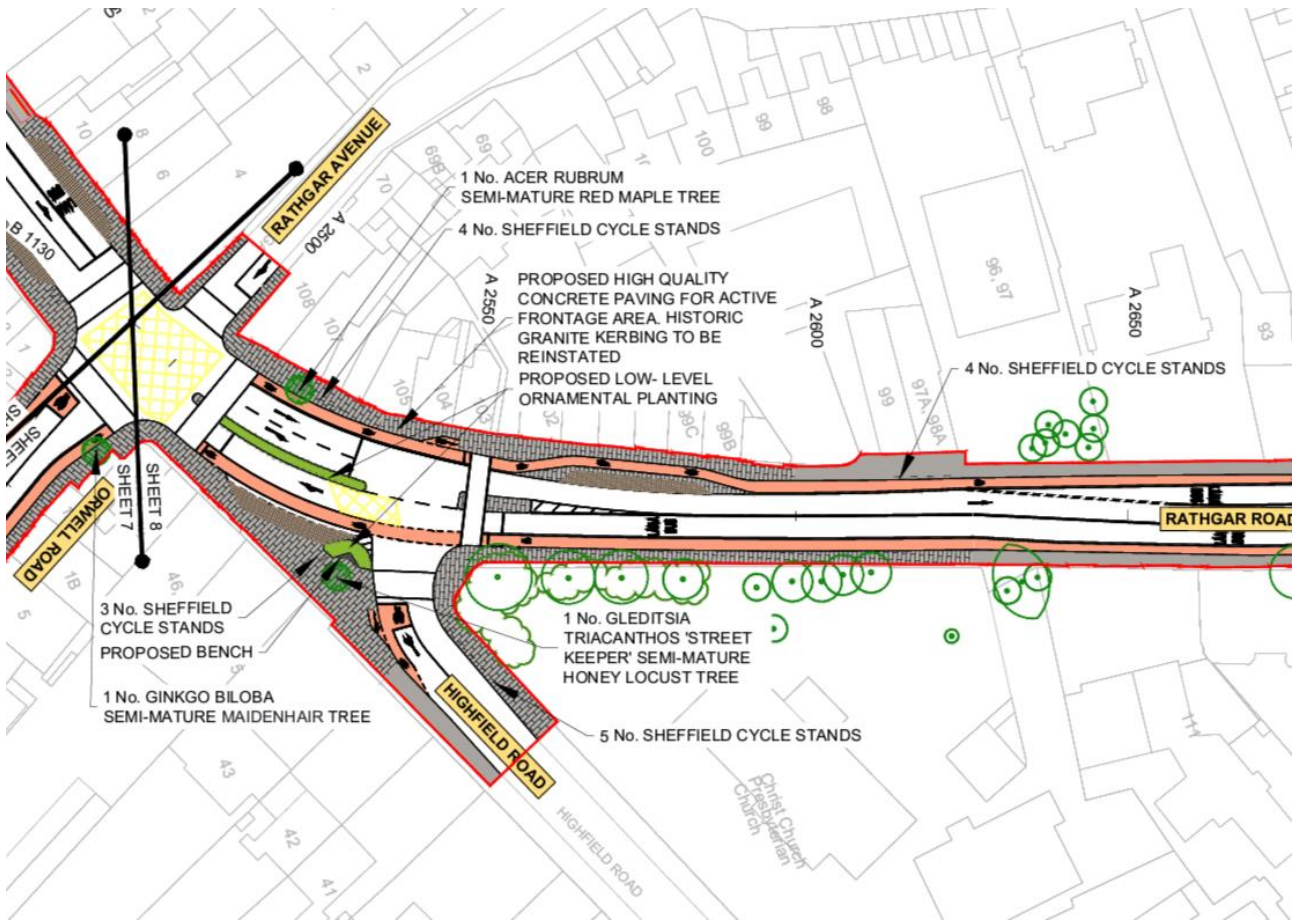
Extract from Landscaping General Arrangement Drawings (Sheet 8)
